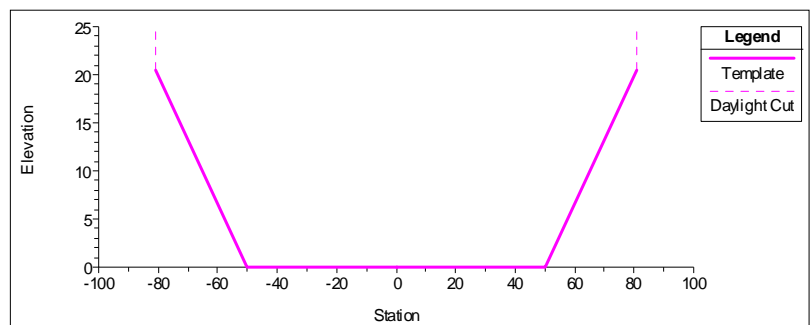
TYPICAL CROSS SECTION OF SCENARIO 1 IMPROVEMENT; SOUTH LEVEE (LEFT), NORTH LEVEE (RIGHT) (ELEVATIONS IN NAVD)
